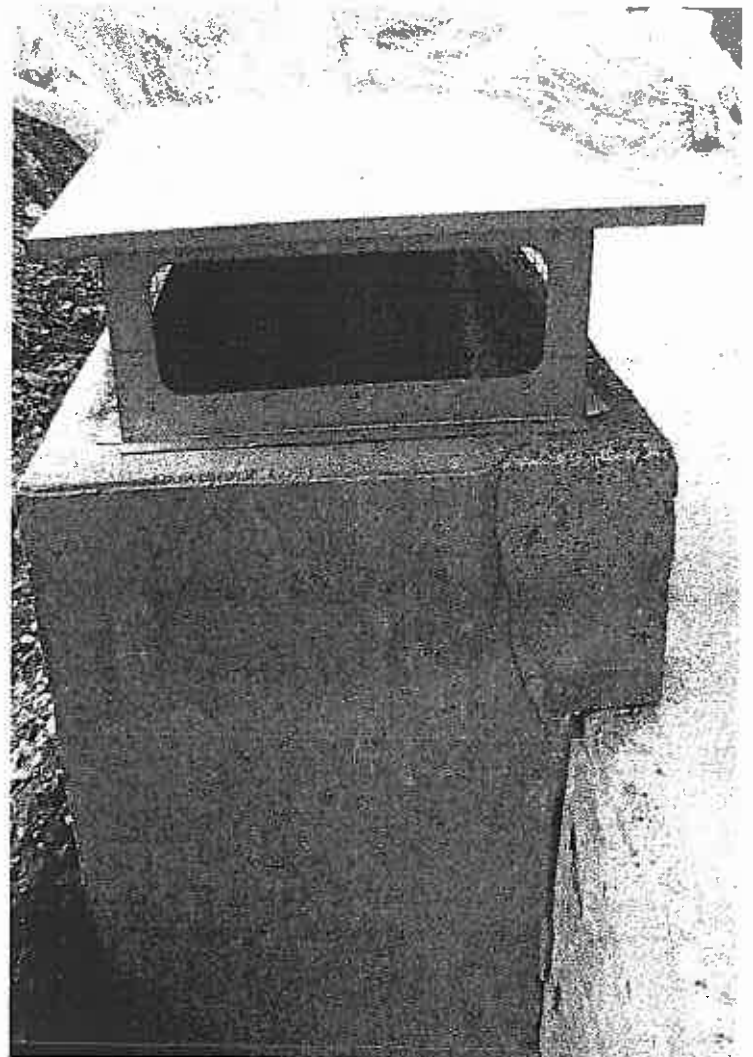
Shows displacement of the air shaft along the south elevation. This air shaft should be moved back into its original position, and mechanically fastened to the perimeter foundation wall.
